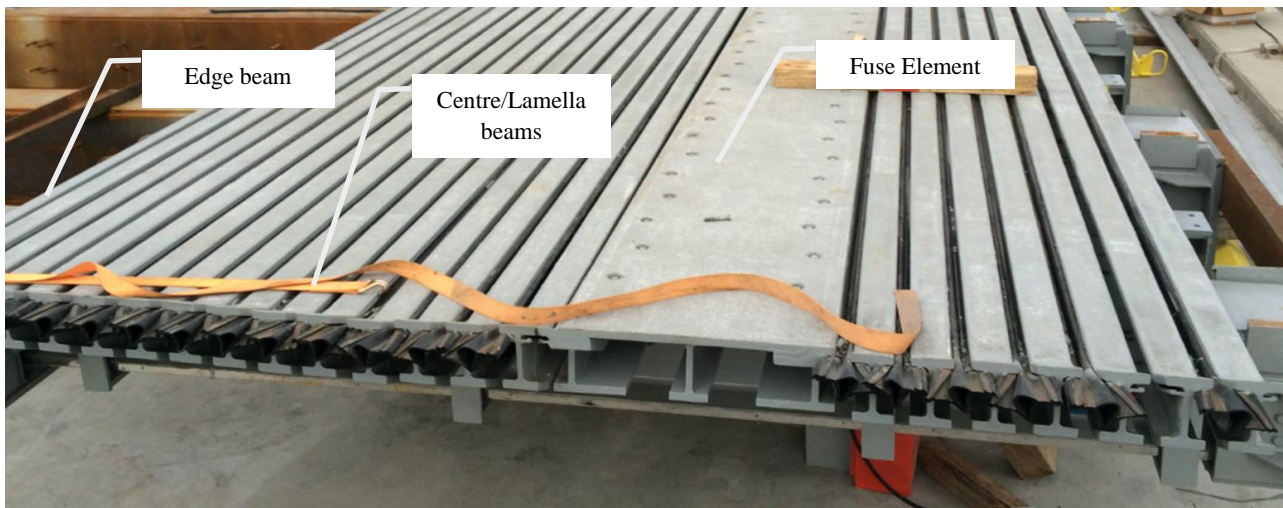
A modular expansion joint, viewed from above, showing the centre beams, Fuse element and edge beams that form its driving surface.
